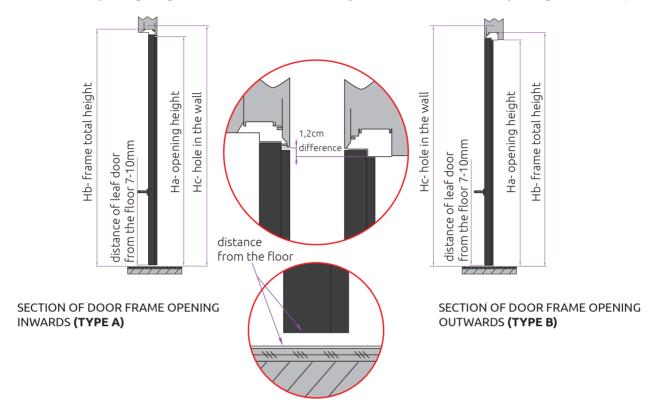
SECTION OF DOOR FRAME OPENING INWARDS (type A)
